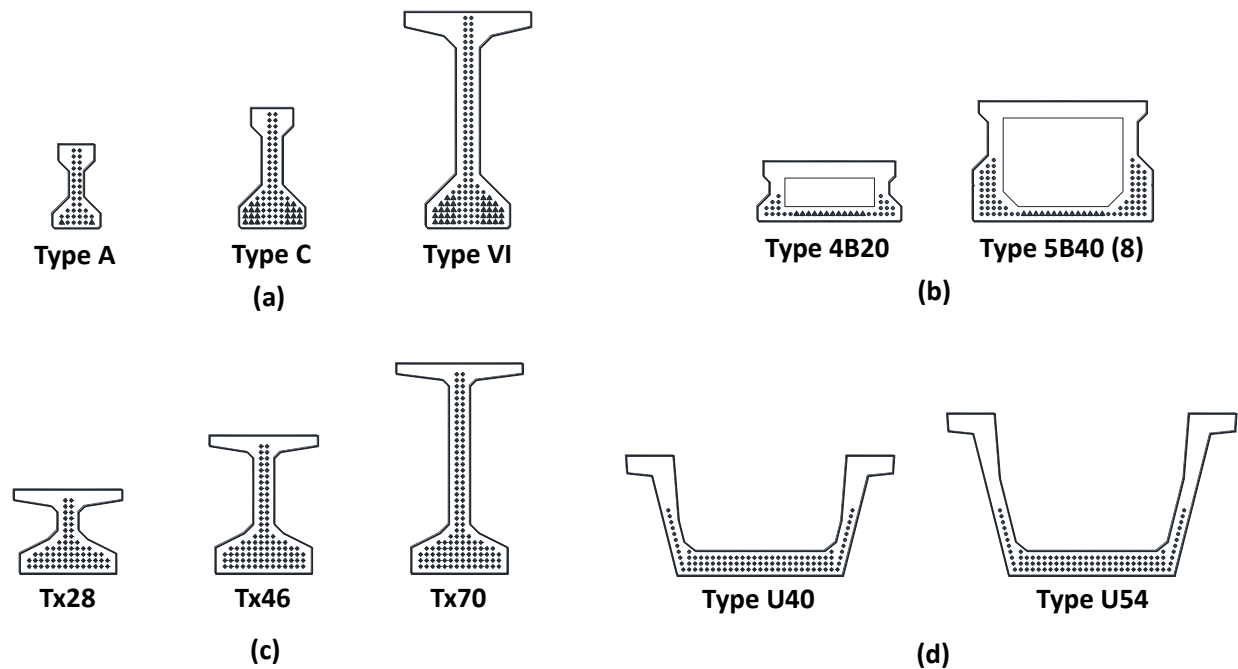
Girder cross-sections investigated in parametric study; (a) I-beams, (b) box beams, (c) bulb-T, (d) U-beams
